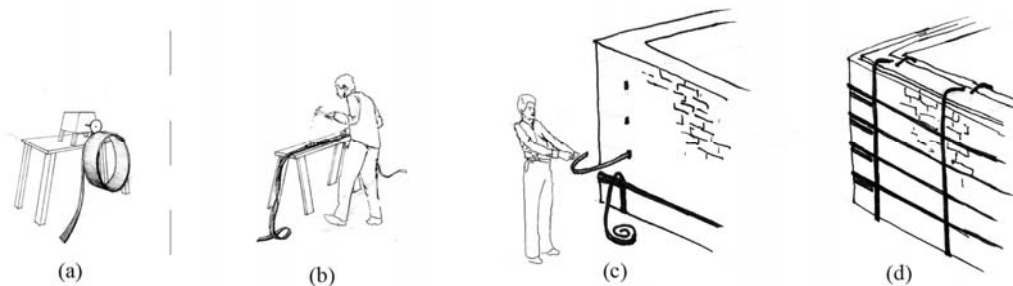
Pictorial summary of strap formation and application. The initial cutting of tyre treads into straps (a) is likely to occur in a factory while all the other stages of construction will occur on-site.
